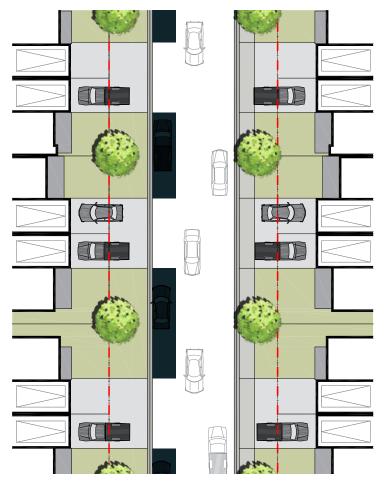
Front-Drive Townhomes Parking Demonstration on Local Road
